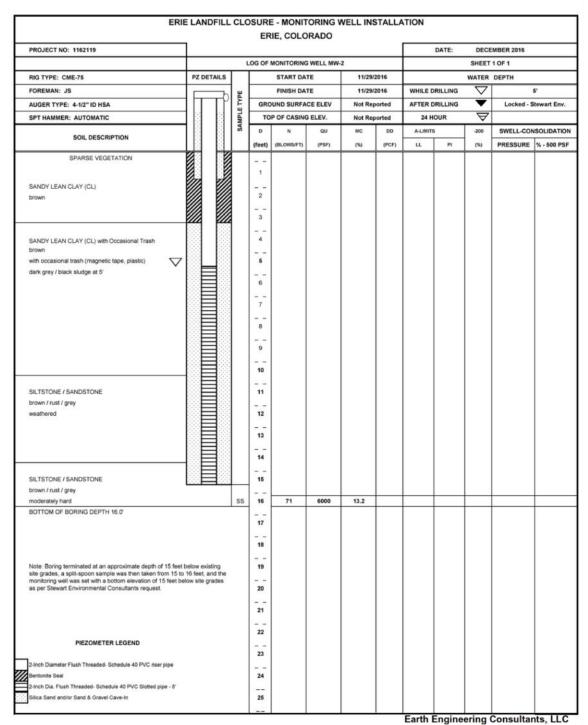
Earth Engineering Test Boring SEC MW-2
